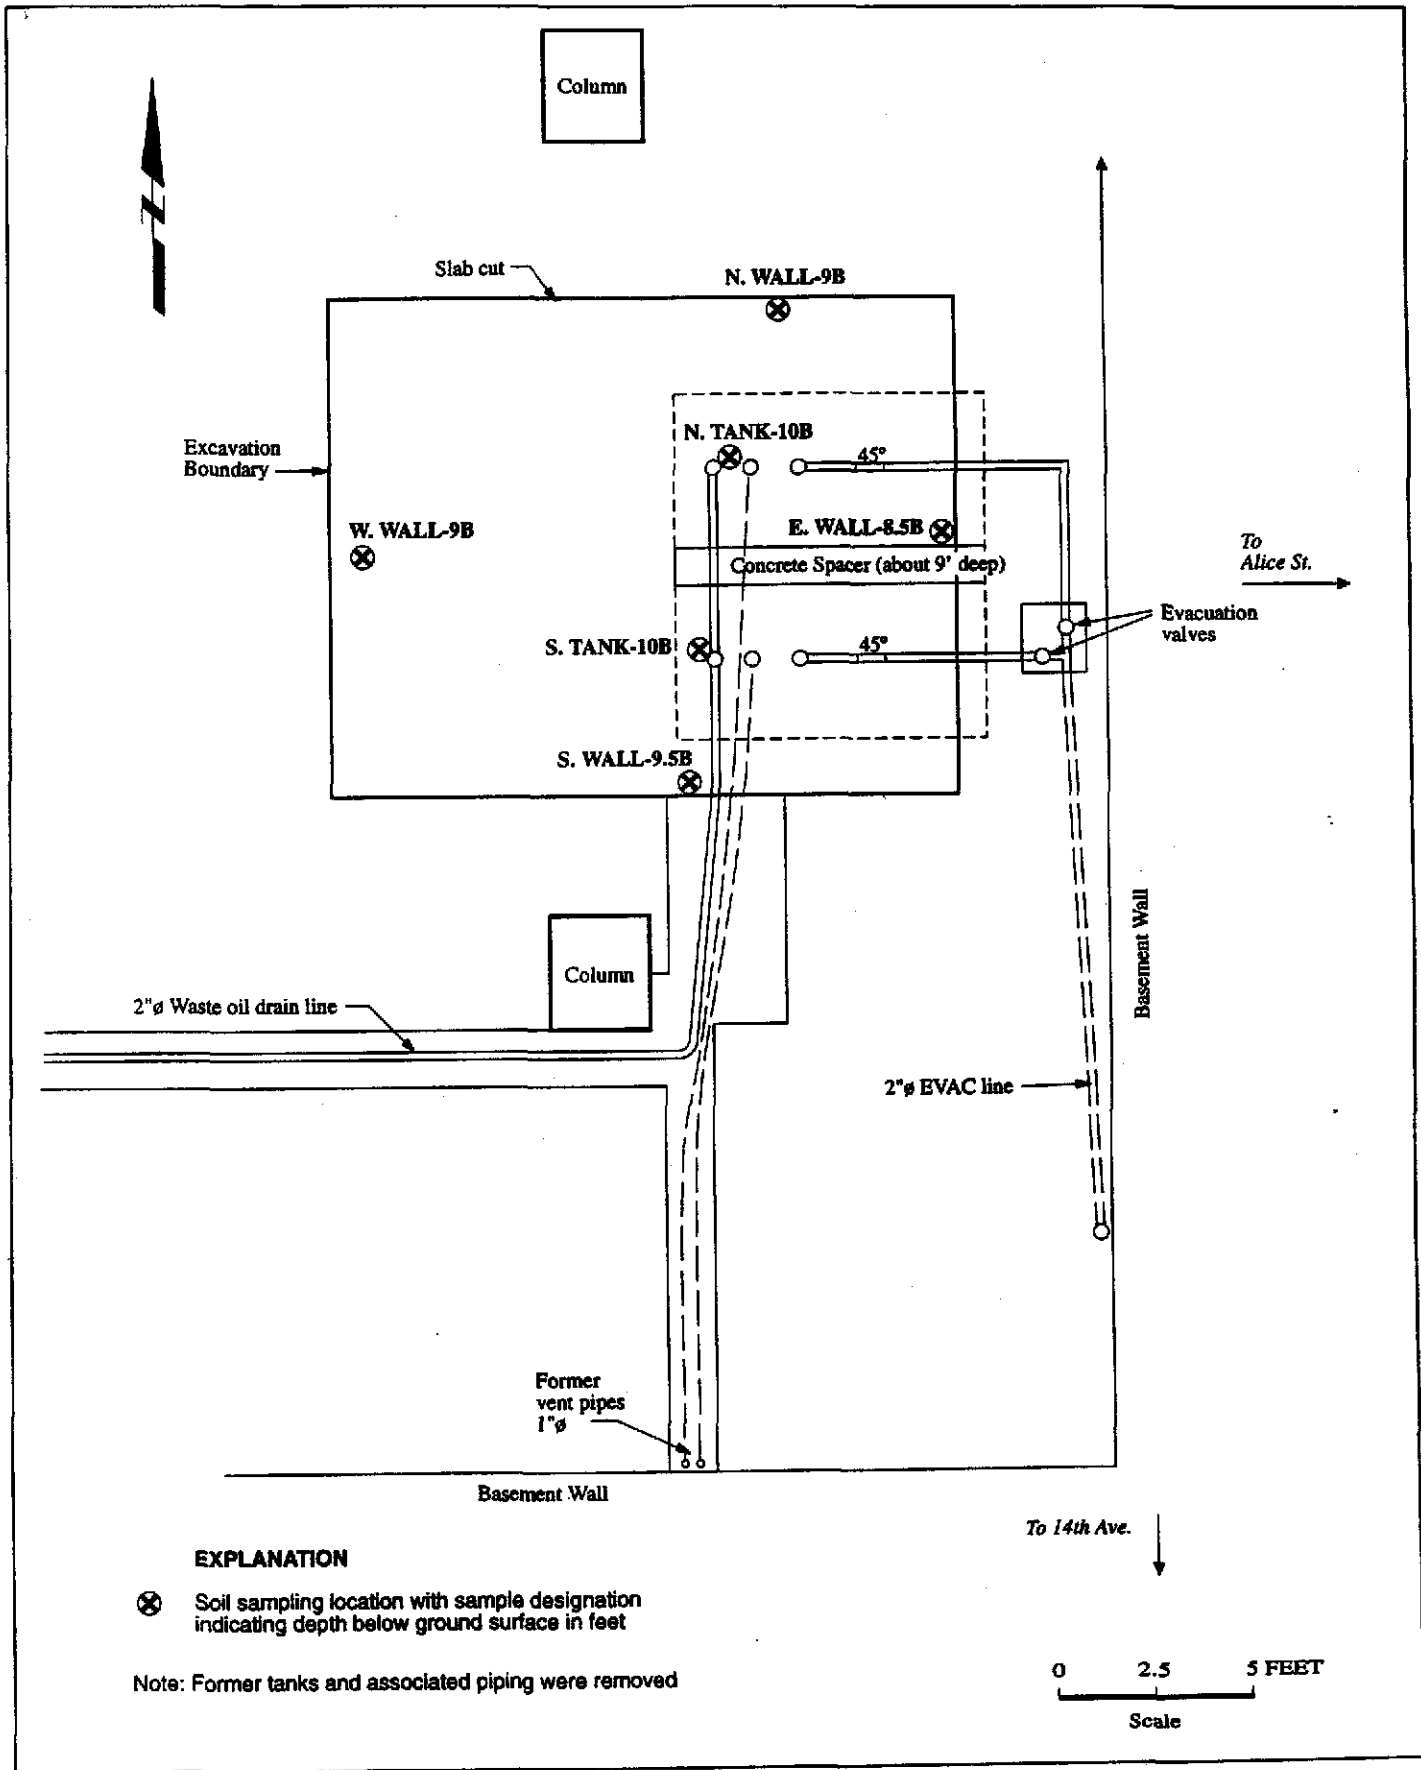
PLAN SHOWING FORMER WASTE OIL TANKS AND SOIL SAMPLING LOCATIONS
